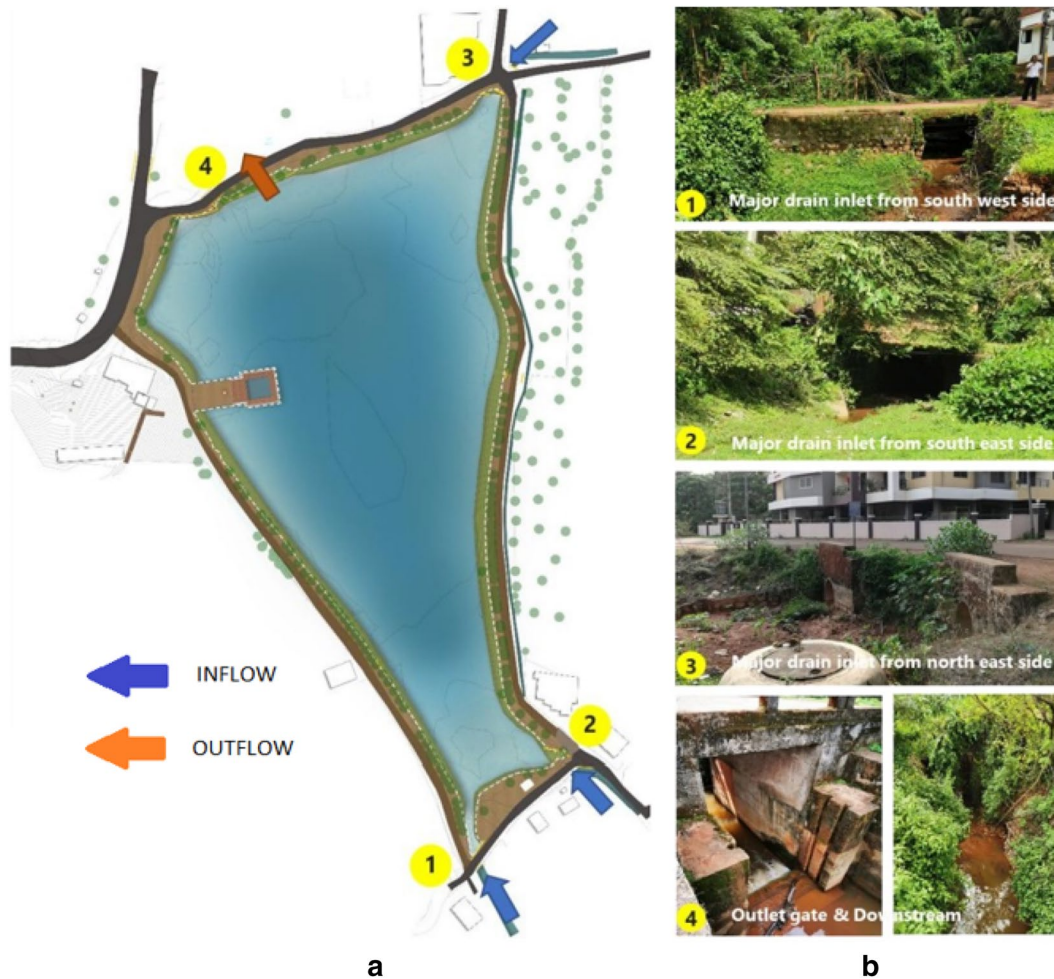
Details about the lake. a Inflow and outflow details. b Drainage location details. (1) A major drain inlet for the southwest side. (2) Major drain inlet on the southeast side. (3) Major intake from the north side. (4) Downstream outlet gate
